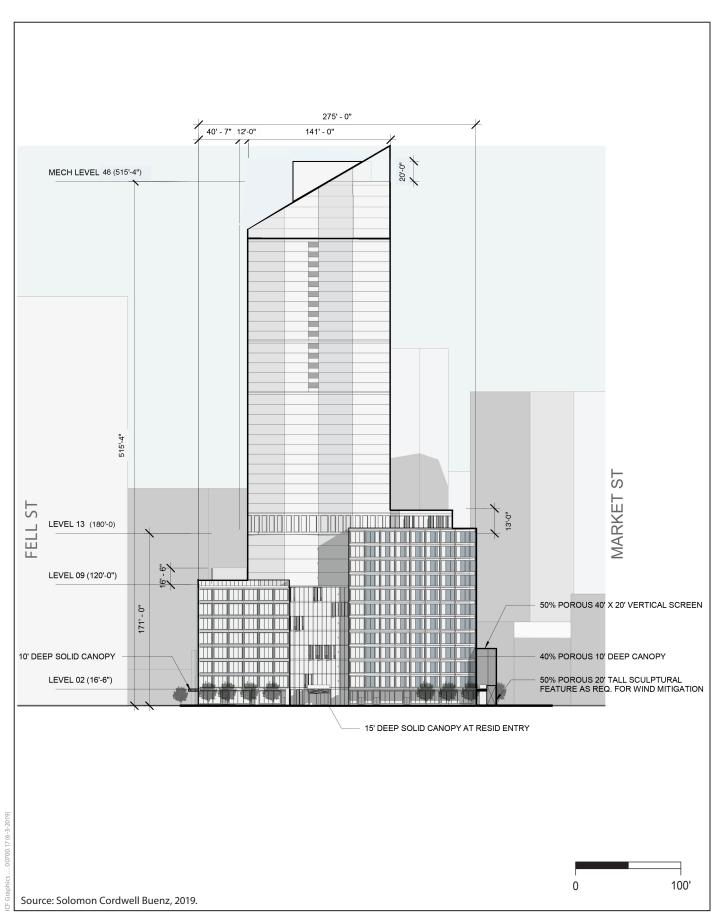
30 Van Ness Avenue Project – Proposed North Elevation
